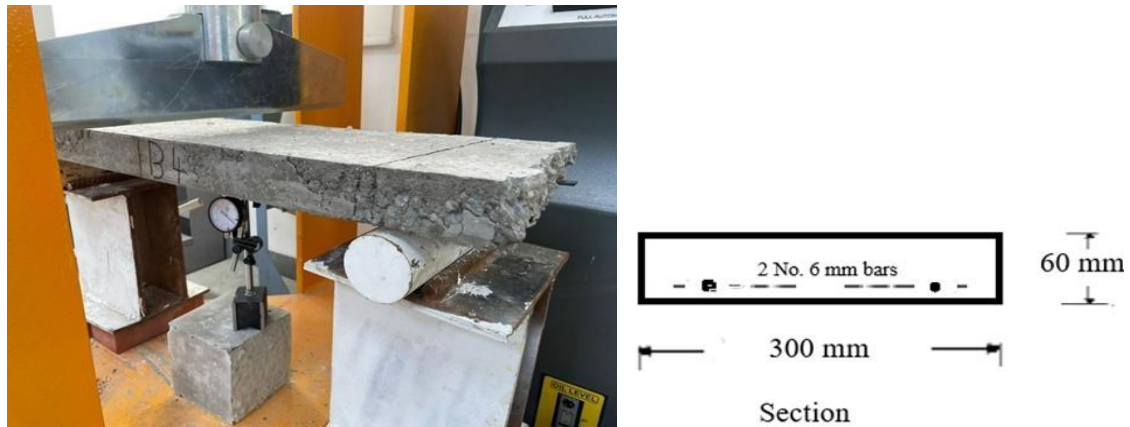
Experimental setup for the wide Beam test. Figure 4: Wide beam cross-section
